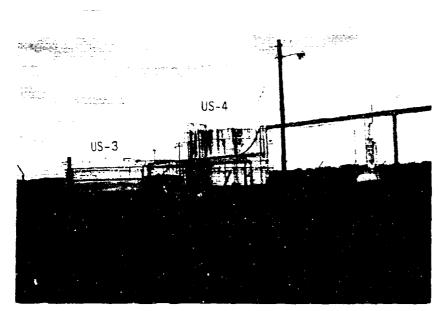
Northwest elevation of tanks US-3 and US-4
